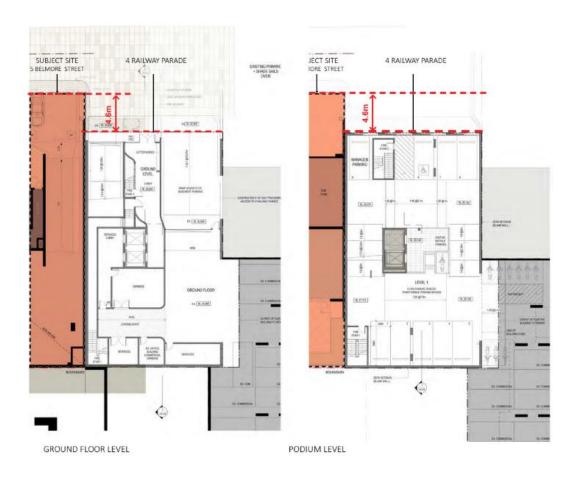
Ground floor and podium level plan at 4 Railway Parade (Source: Squillace)
